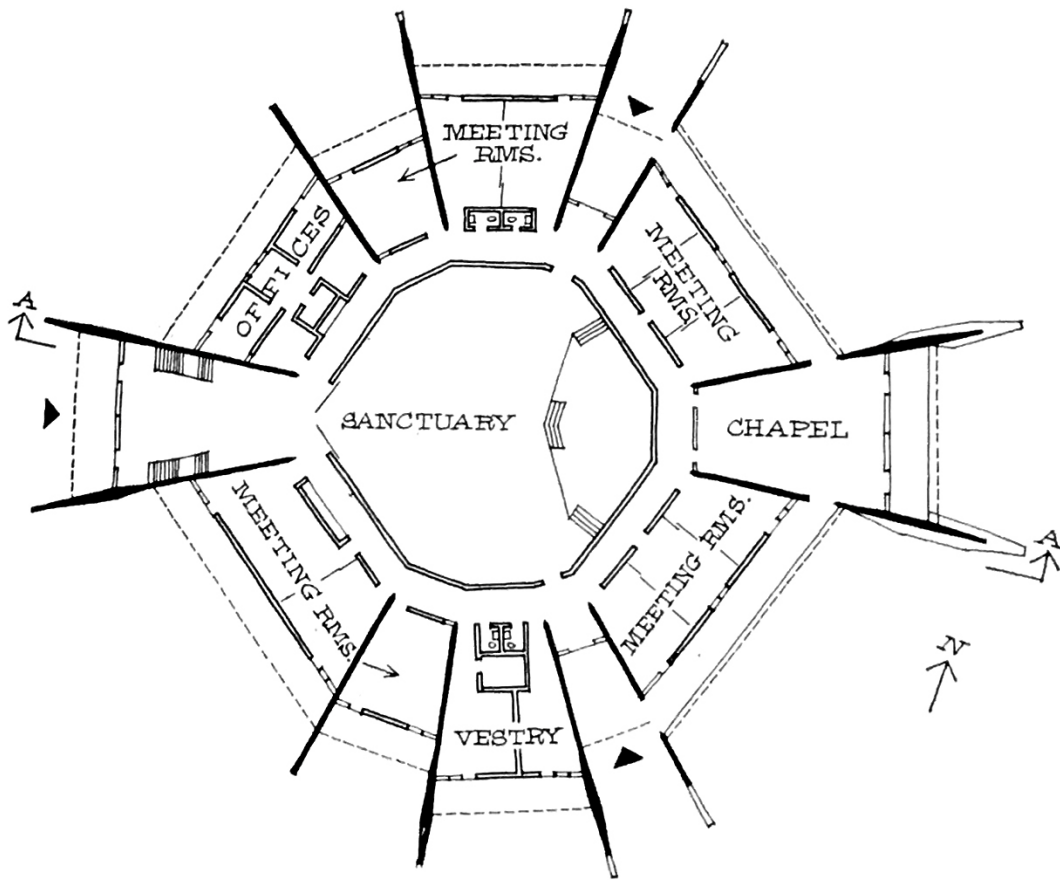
of 13. Main-level plan with concrete radial walls shown in bold lines. "Connecticut Prayer Tent." *Architectural Forum*.
